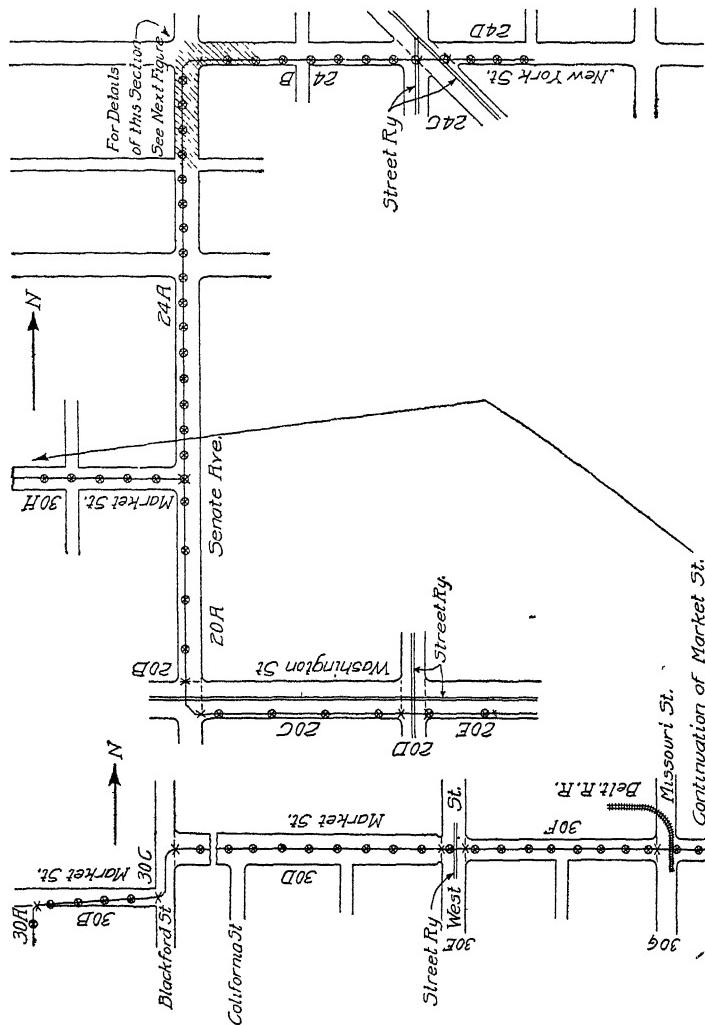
Layout of Section on Reinforced Concrete Conduit For Details of Shaded Portion See Fig. 12
